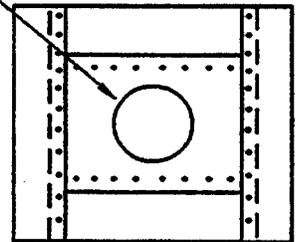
PLATES TO BE PRE-CUT, CLAMPED TOGETHER, PRE-DRILLED AND LABELLED TO FACILITATE WATERTIGHT FIELD ASSEMBLY
